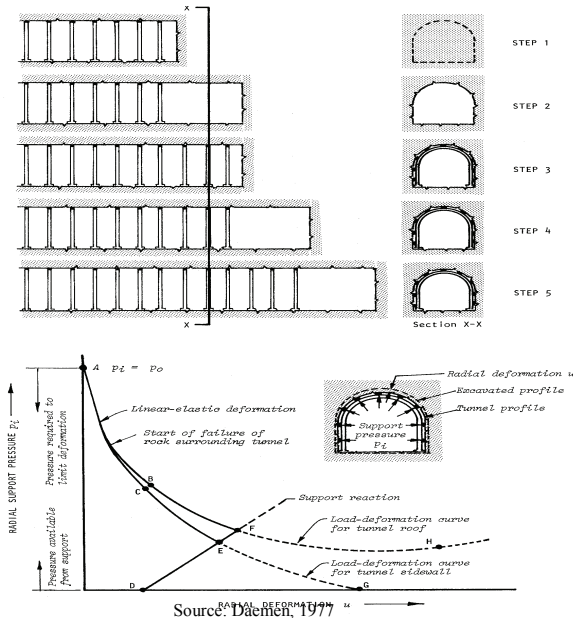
Hypothetical drilling and blasting tunnel excavation with steel set support and load deformation curves
